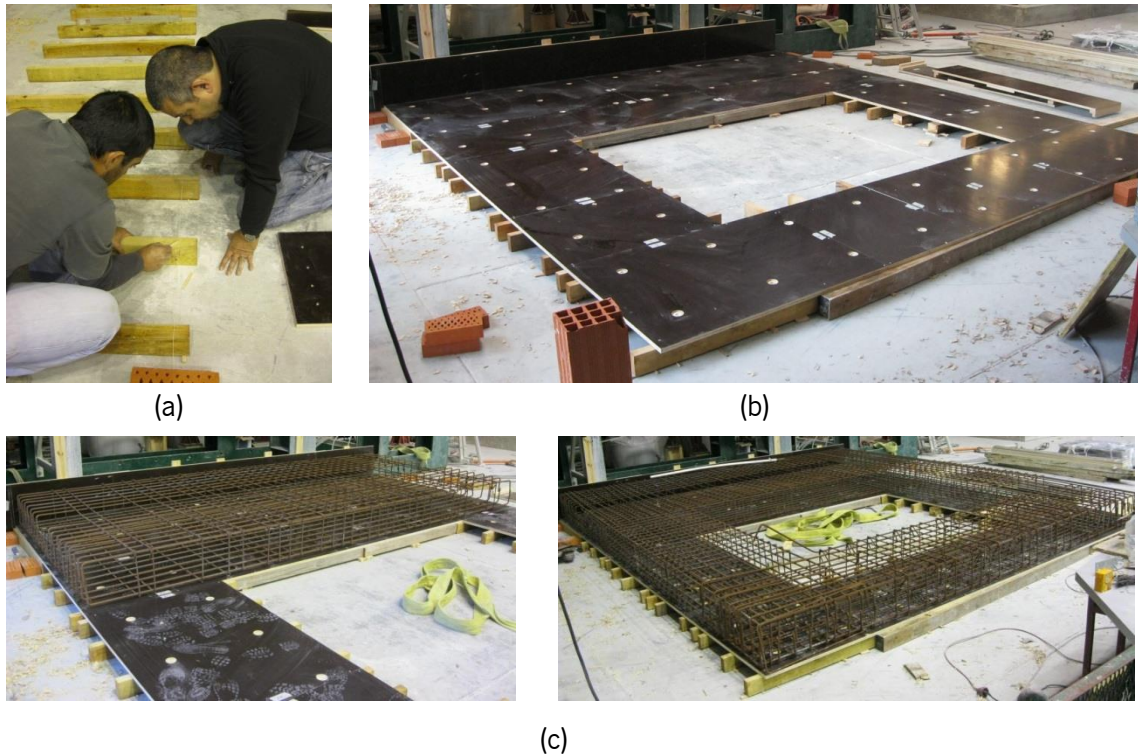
Construction of foundation: (a) wooden sticks for leveling, (b) formwork boards with smooth surface, (c) placing of steel reinforcement
